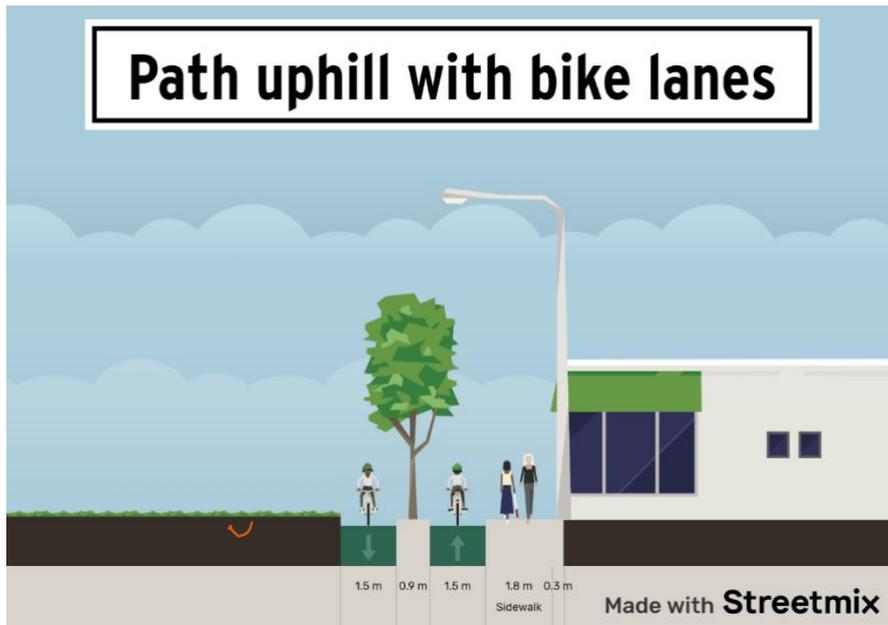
Indicative cross section for a path uphill with bike lanes.
